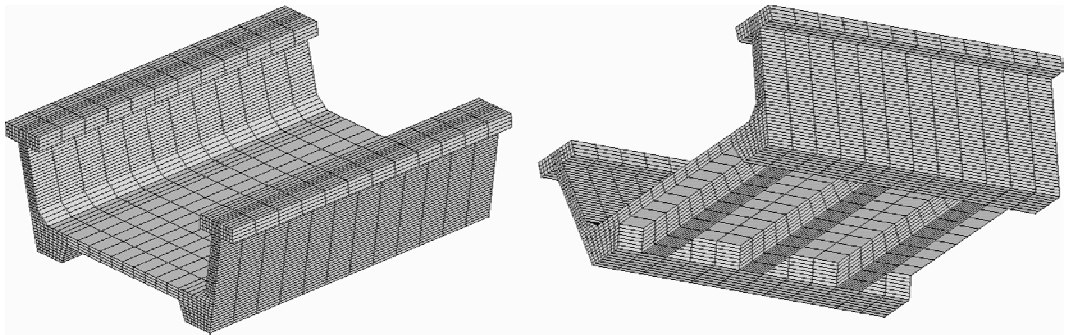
Finite-element model segment of a typical steel and concrete composite U-shaped girder.
